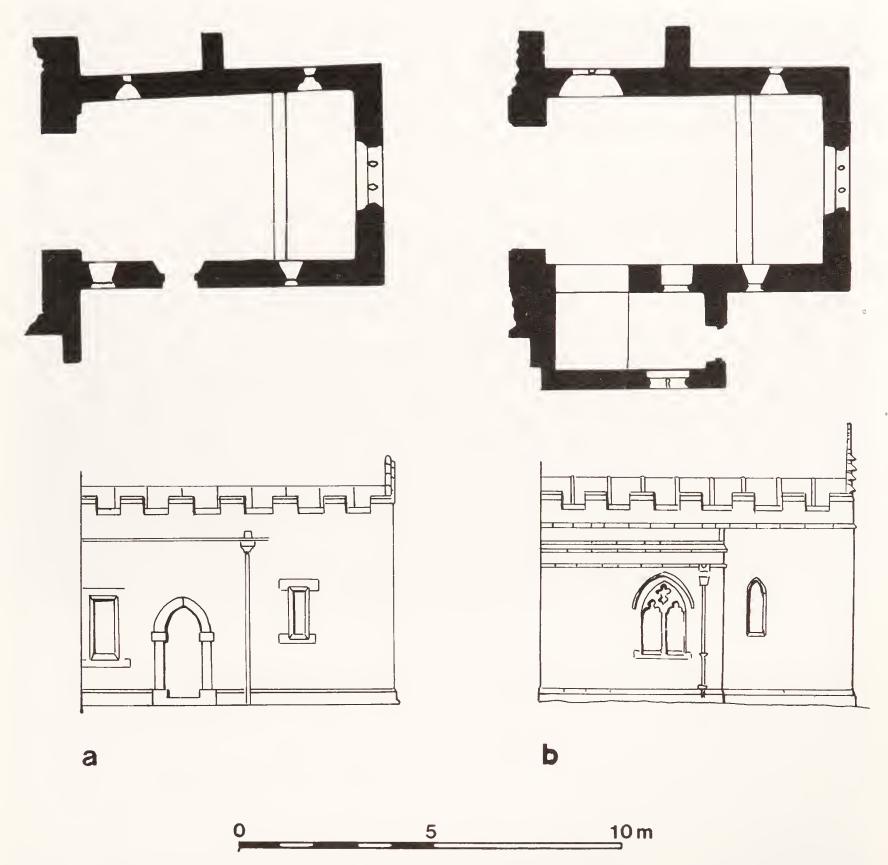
Plan and south elevation of chancel a) 1874 b) c 1880 (after originals in the Church Commissioners' archives).
